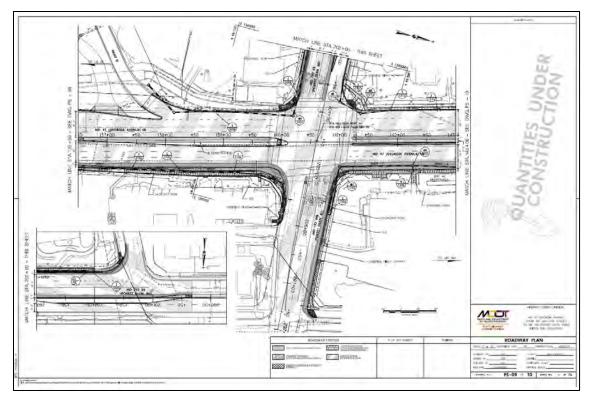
Plan View – Georgia Avenue at Forest Glen Road
